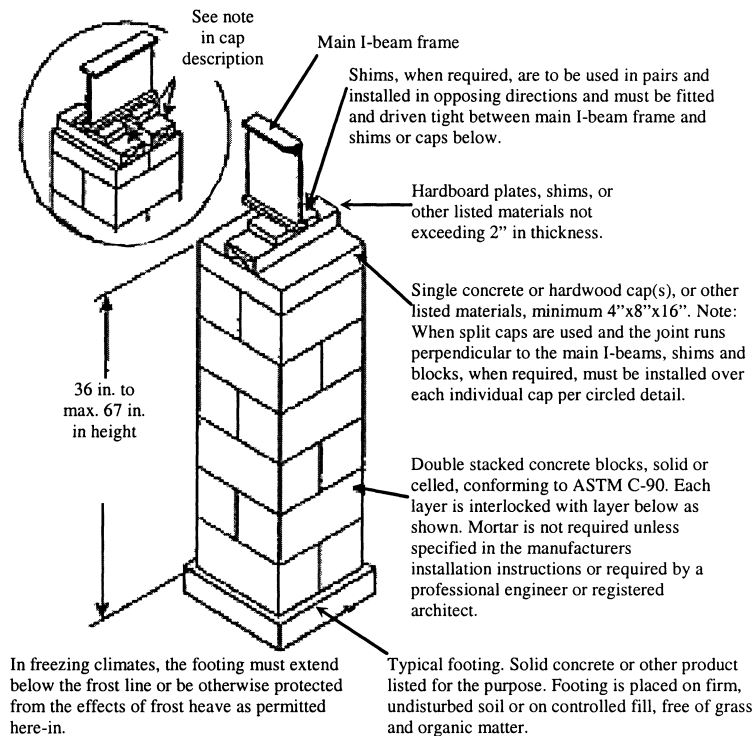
(b) Typical Footing and Pier Installation, Double Concrete Block.§ 3285.307 Perimeter support piers.
